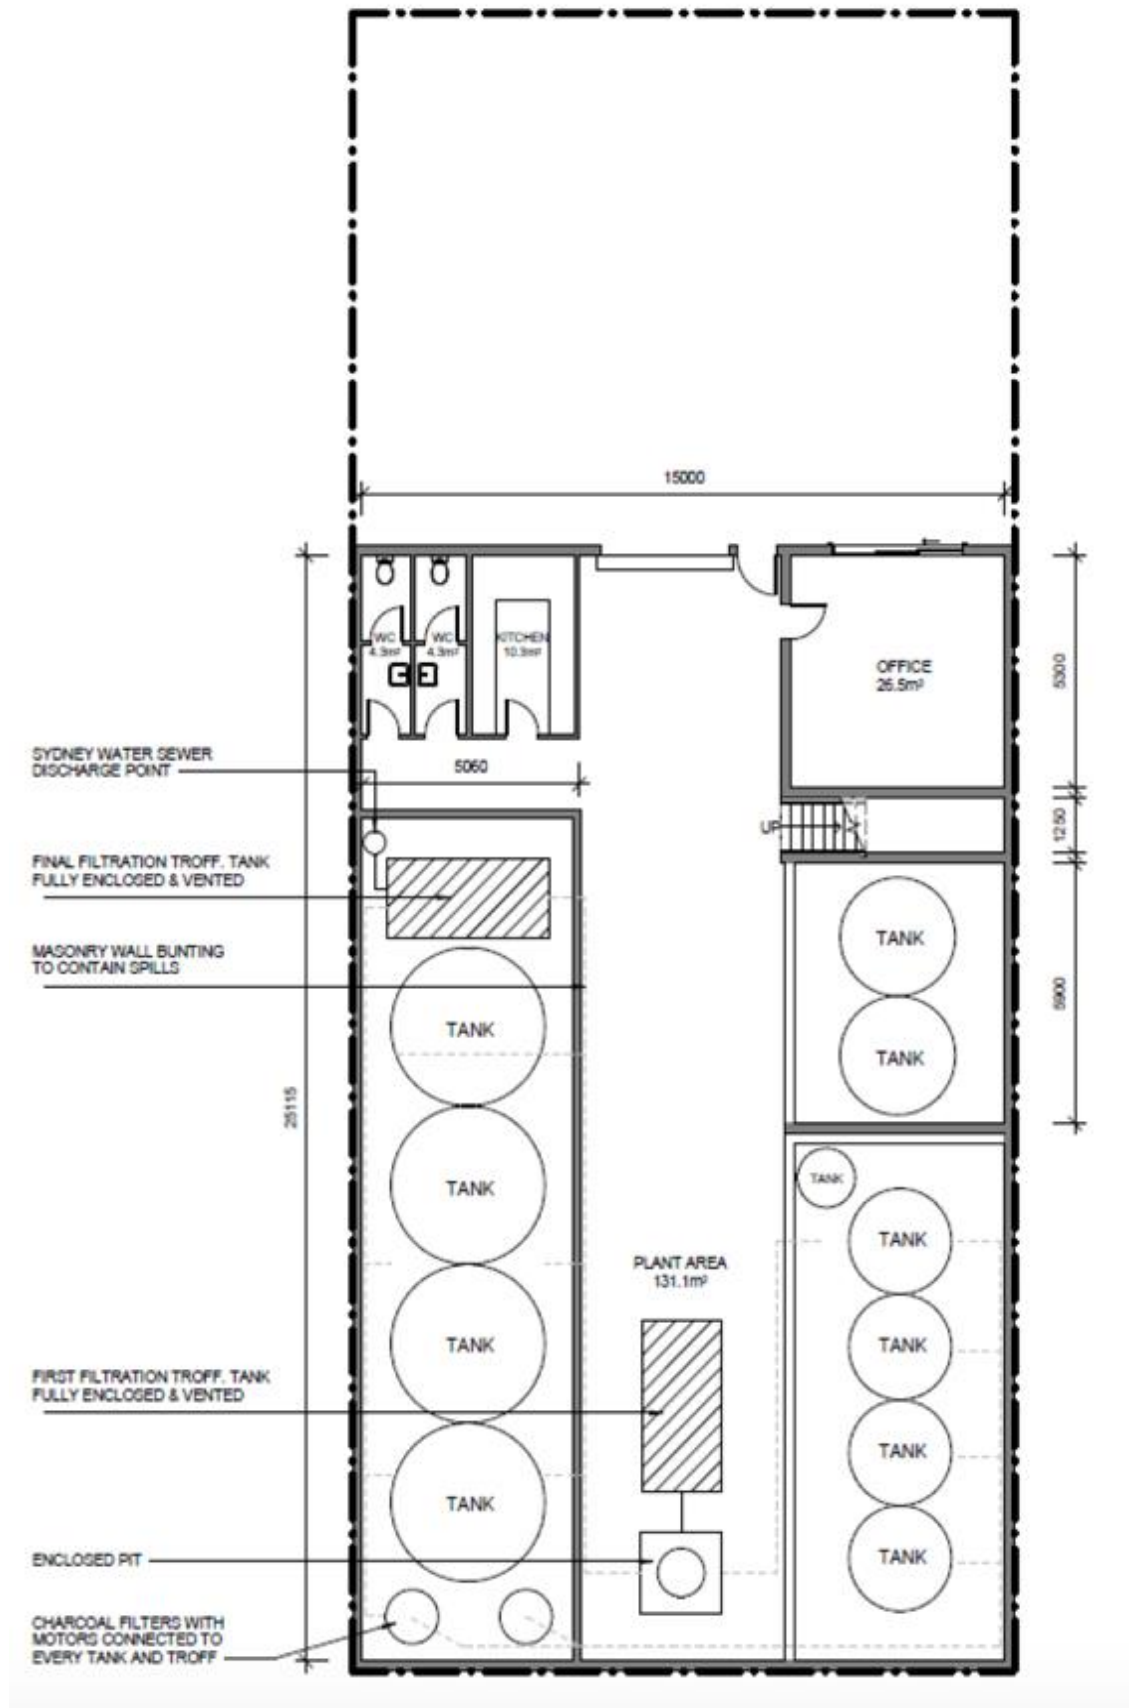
Floor Plan for the proposed development at 14 Kiara Crescent, Yennora.
